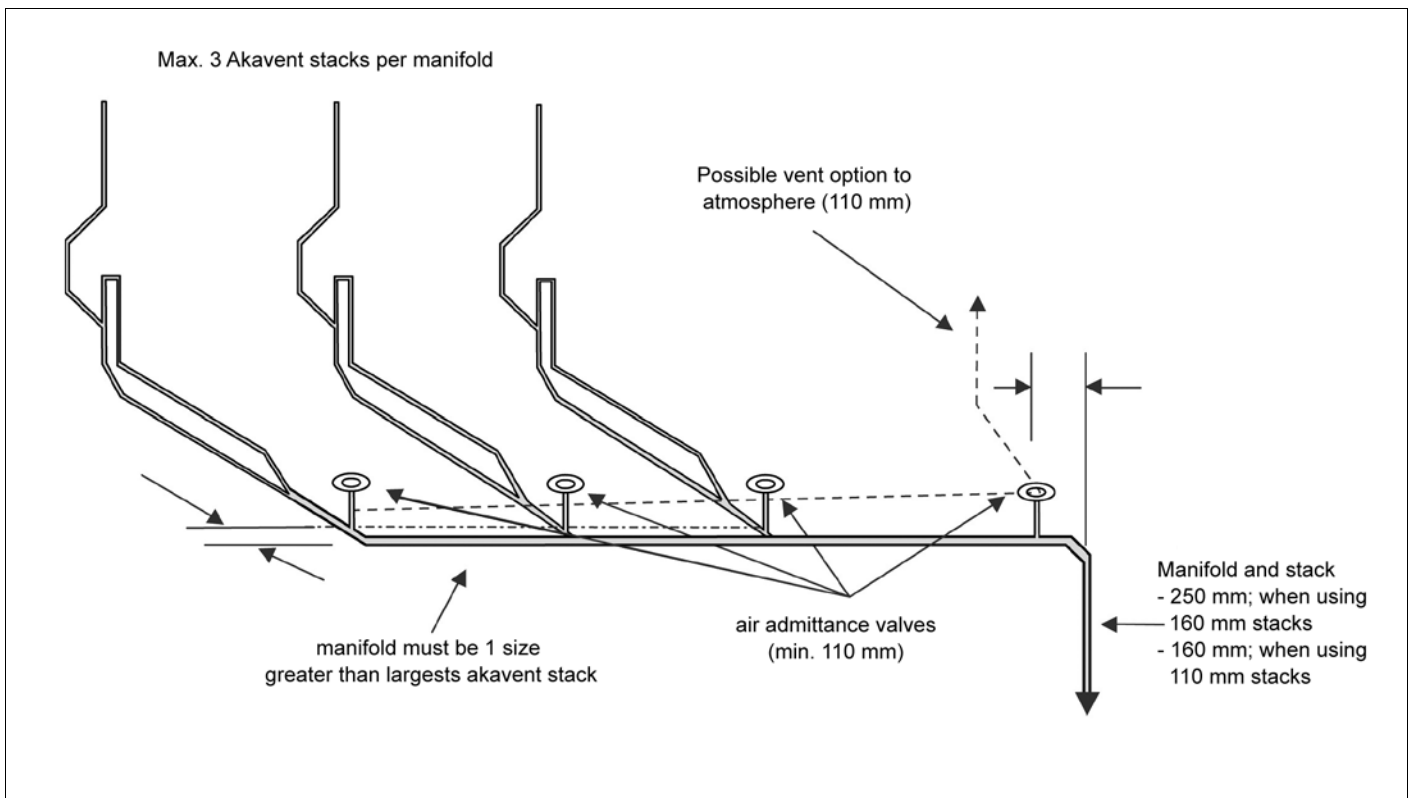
Manifolding of stacks in ground/first floor ceilings
